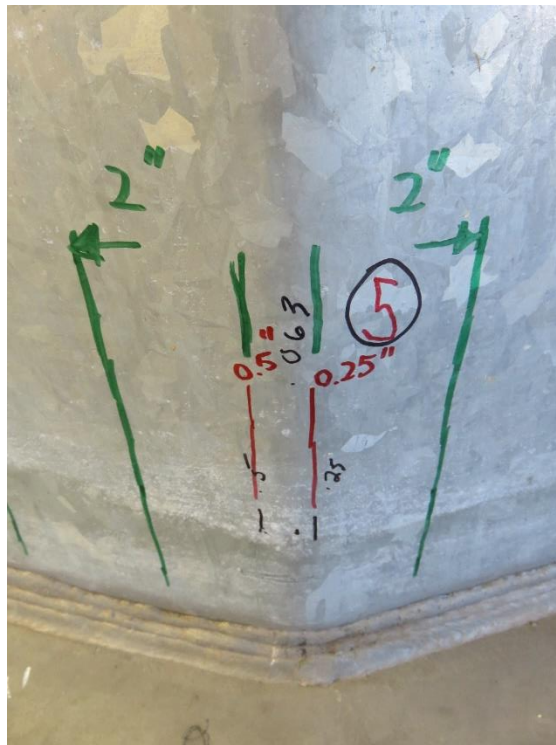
State of Cracks: Specimen 33-3-12-TX-A2 – Bend 5
